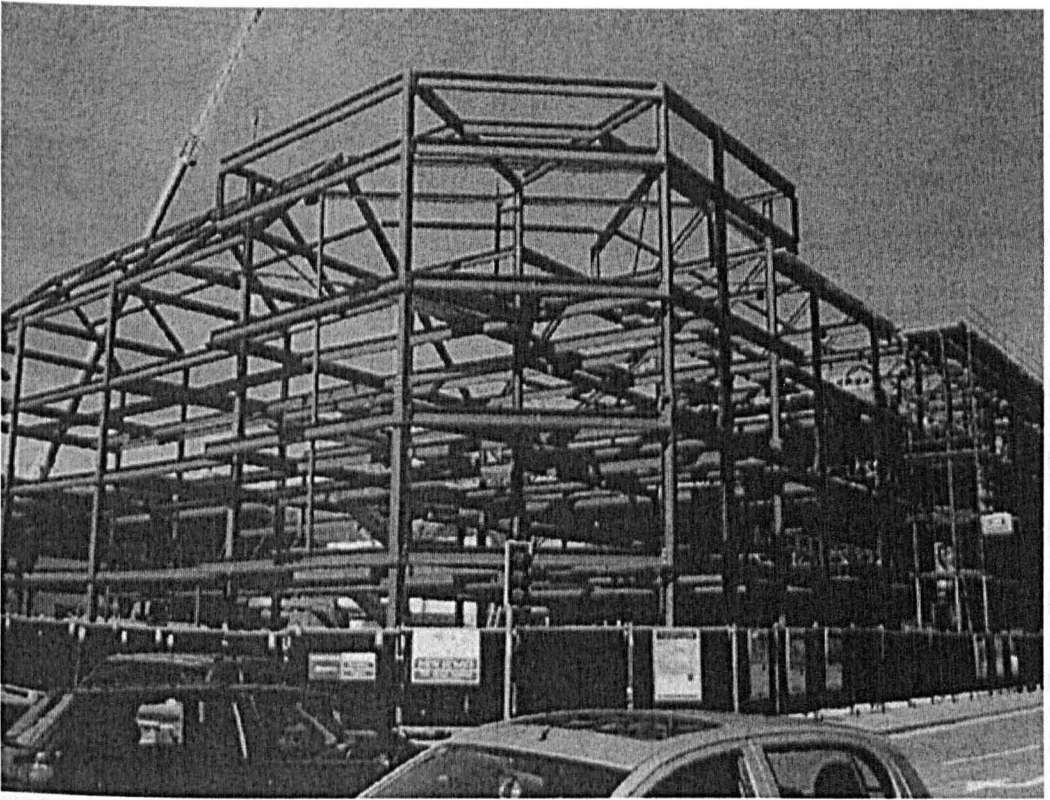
Example of a framed structure using steelwork (from RM Construction, website).
